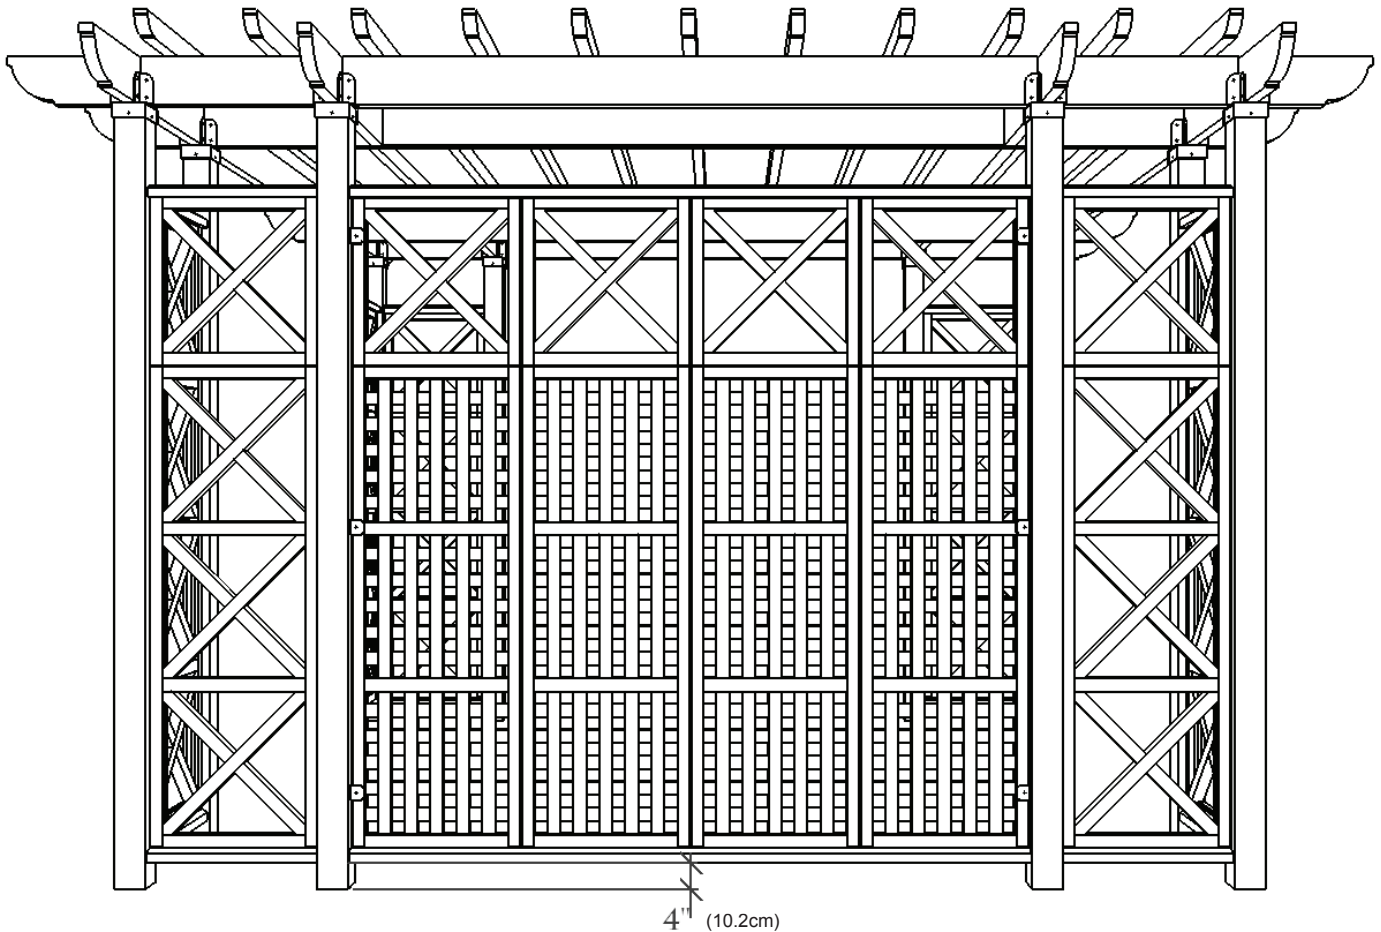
Predrill Holes and Fasten with S5- 1" Pan Head Screw
